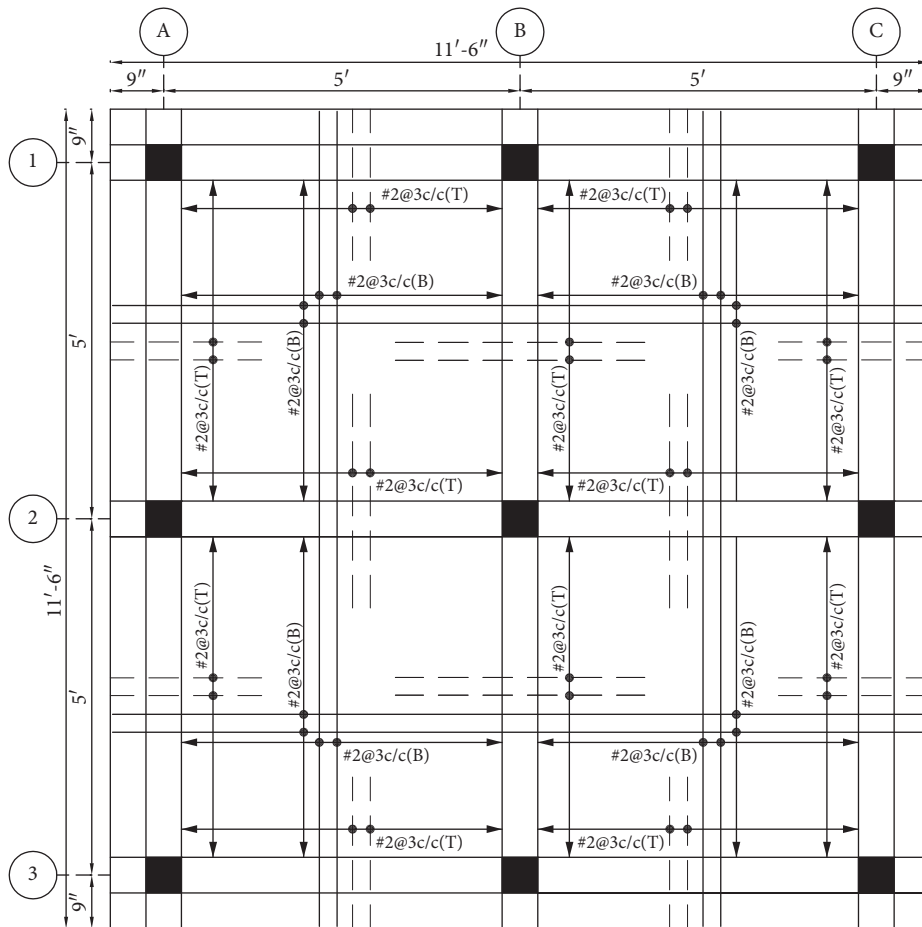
Plan view of first- and second-storey specimens with slab reinforcement details.
